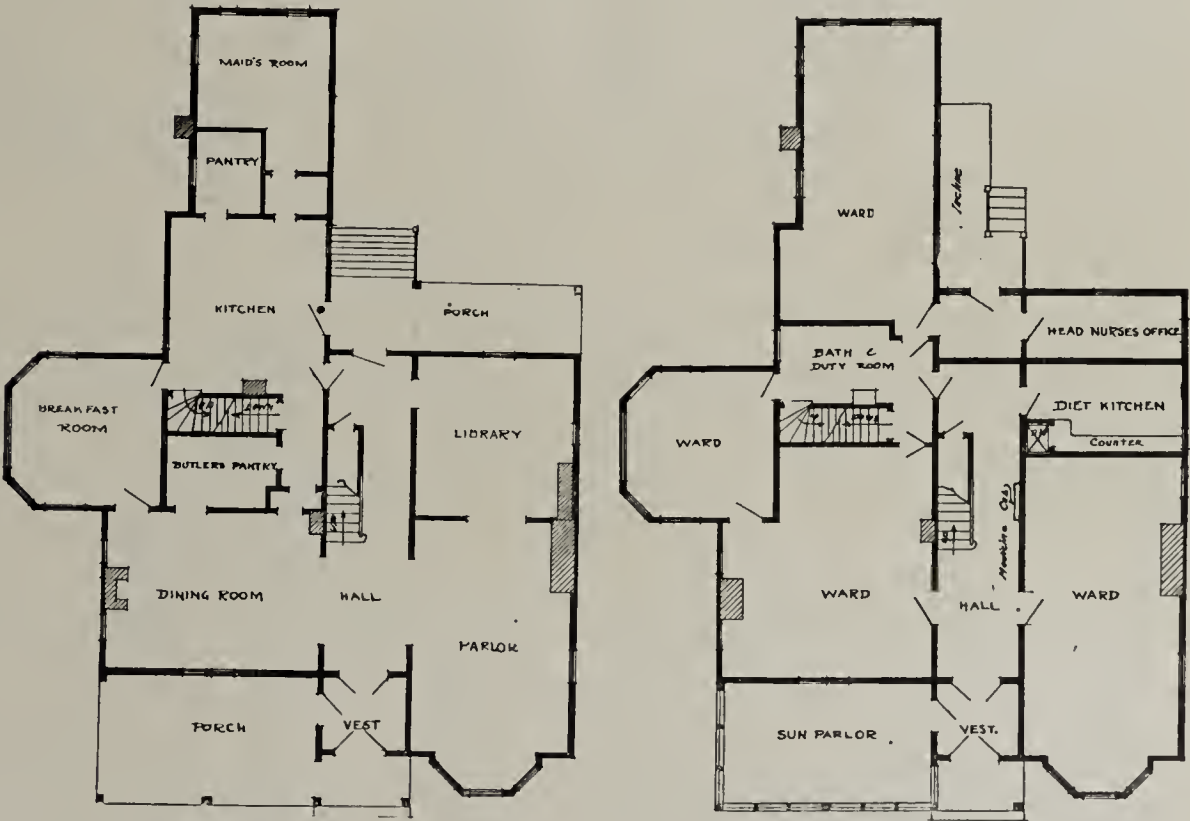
Lymanhurst, first-floor plan, before alterations.
